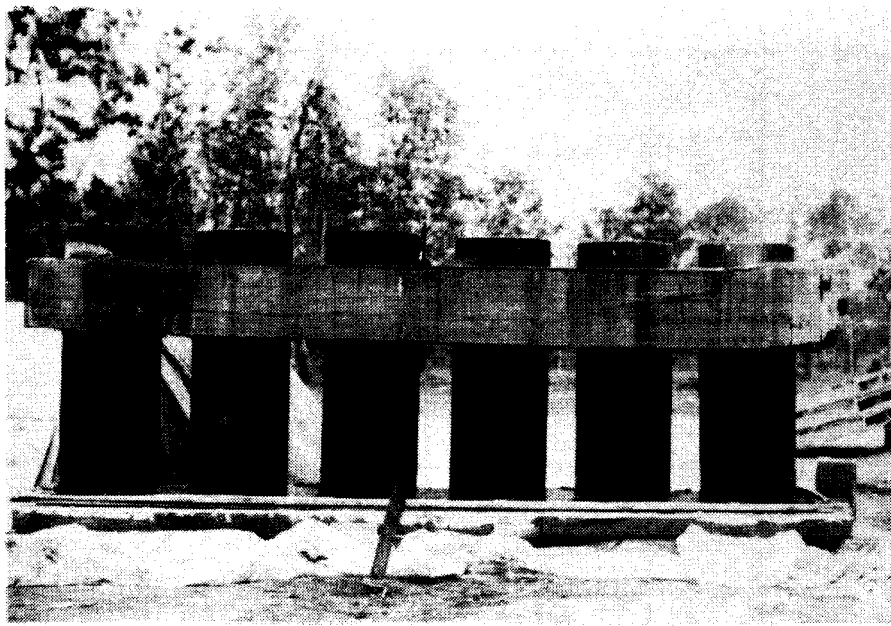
Rack View of Quarter Scale at Disassembly.
